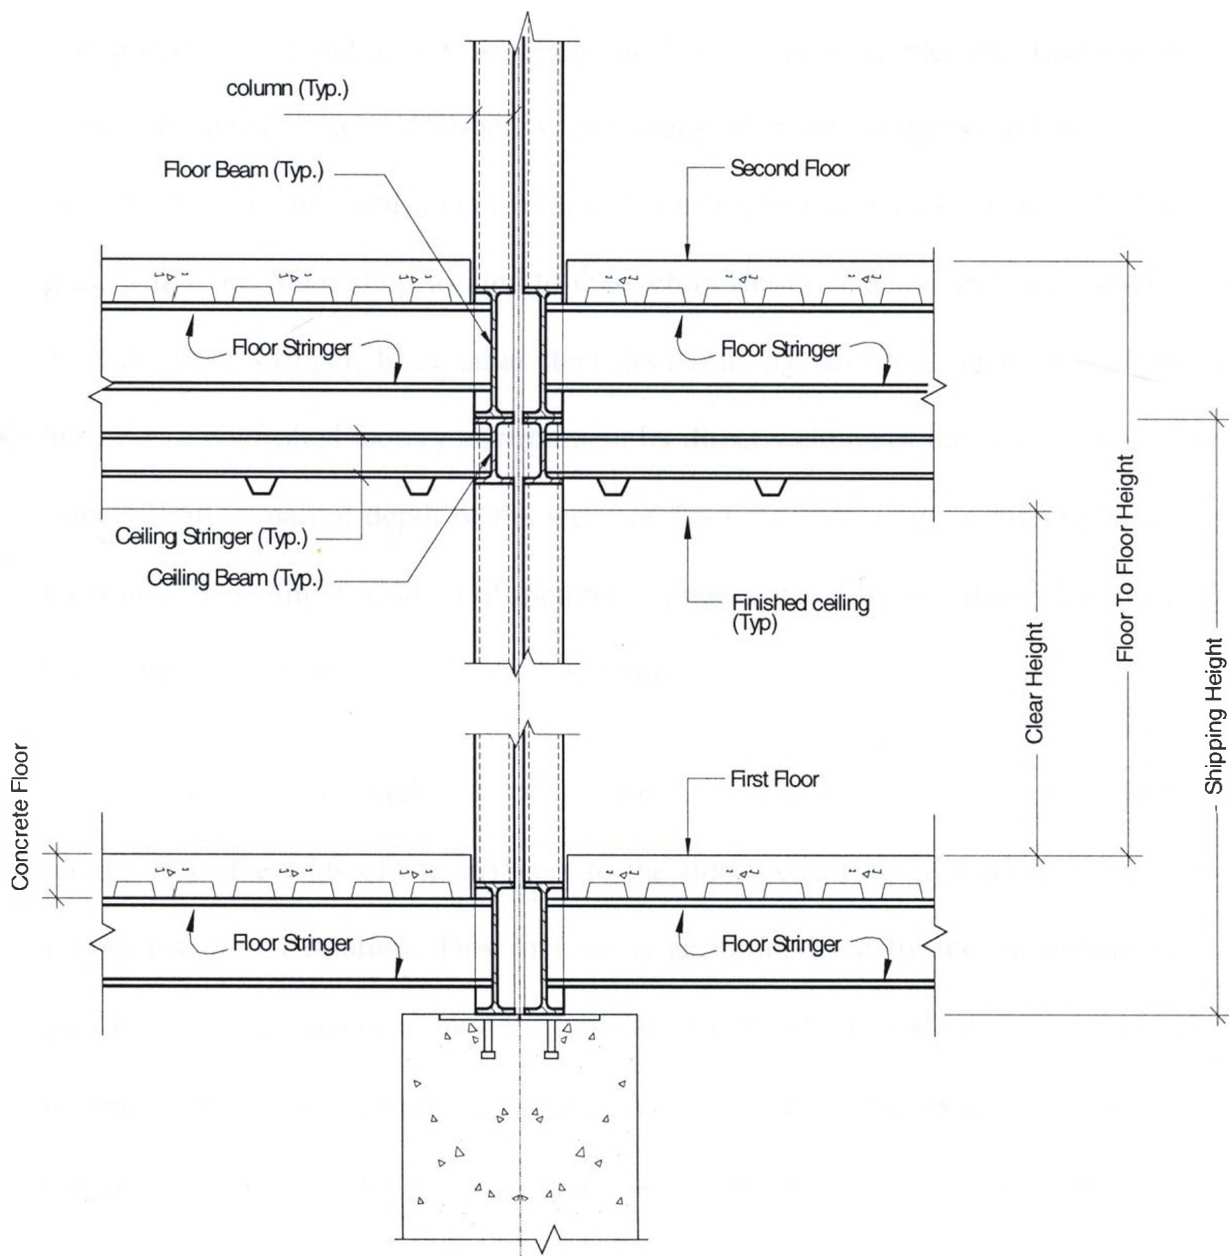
A Section Through a Typical Modular Floor Assembly
